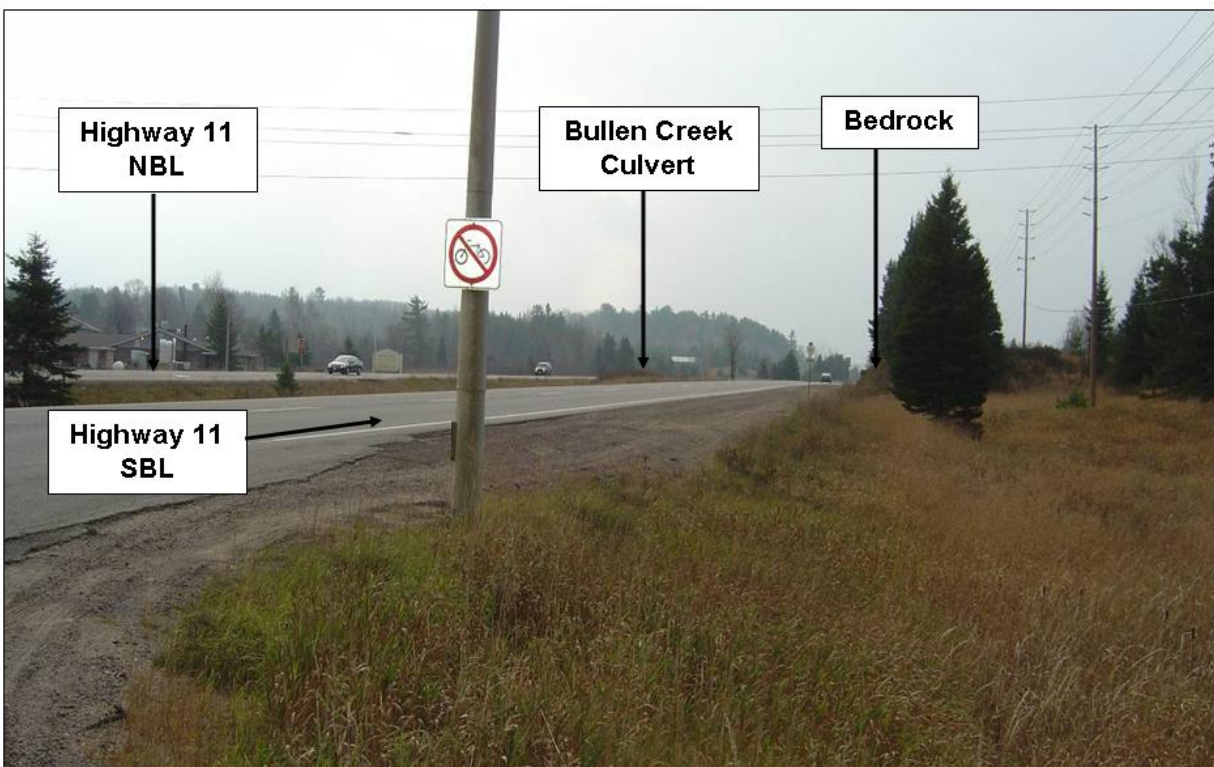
VIEW: Looking west from south shoulder of Allensville Road, about 20 m west of the at grade crossing with Highway 11 SBL. Extensive bedrock outcrops in ridge beyond Allensville Road. (Nov. 2007)
